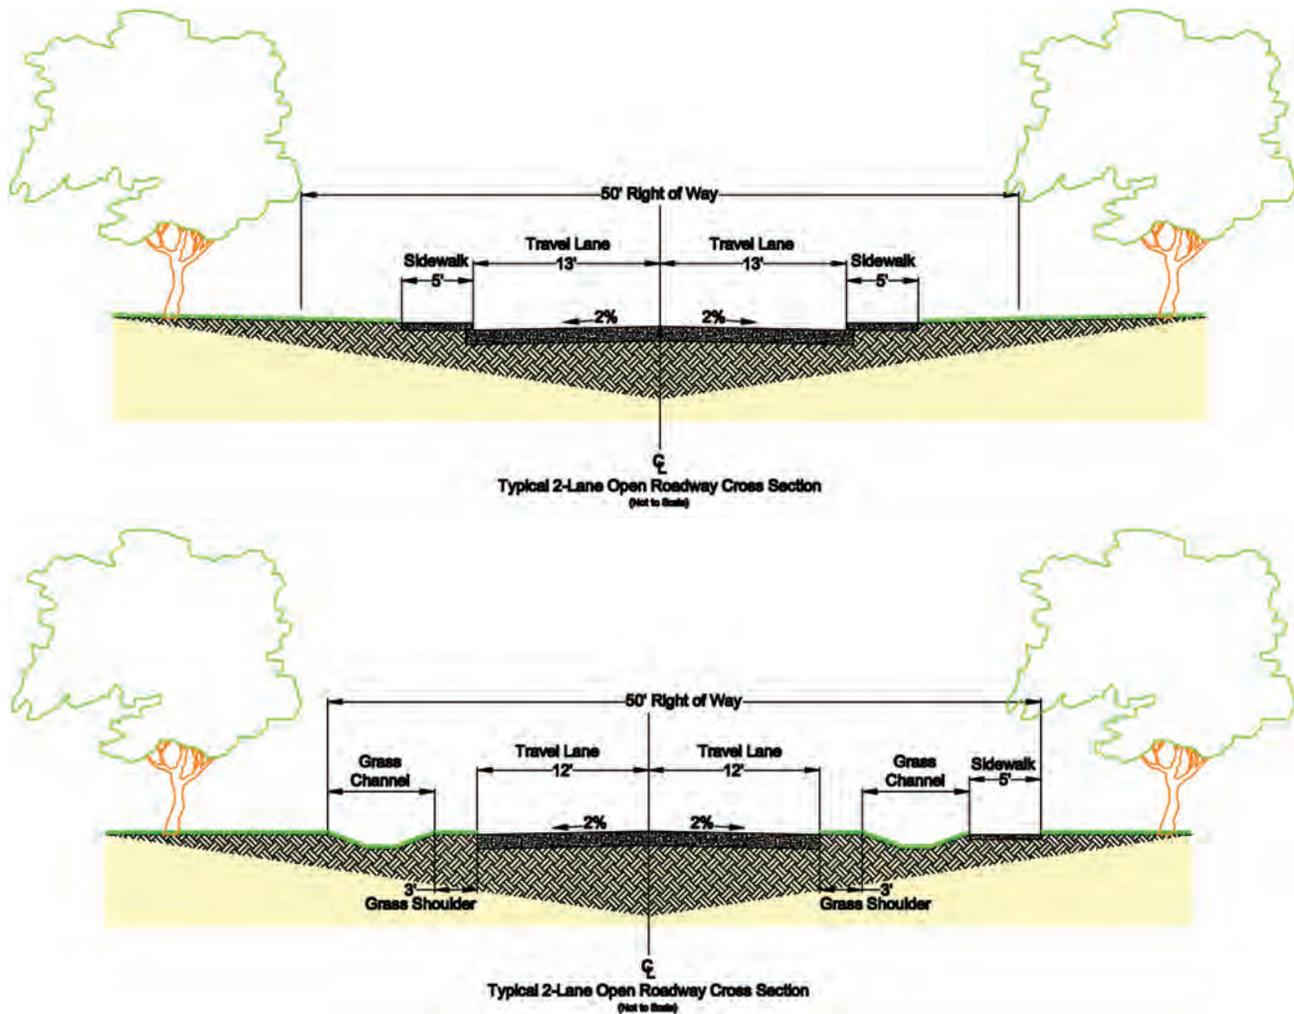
Right-of-way cross sections. Both roadways have a 50-ft ROW. The top cross-section shows how a typical road produces excessive impervious cover with 26 feet of pavement and sidewalks on both sides of the street. The bottom cross section demonstrates how an LID design includes roadside swales, narrower travel lanes, and a single sidewalk (Image: Center for Watershed Protection).
